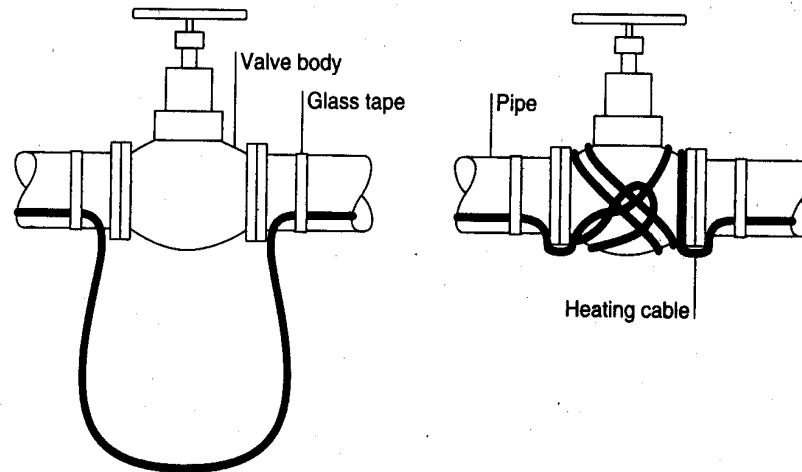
Heat Trace Installation Over Removable Valve Bodies
